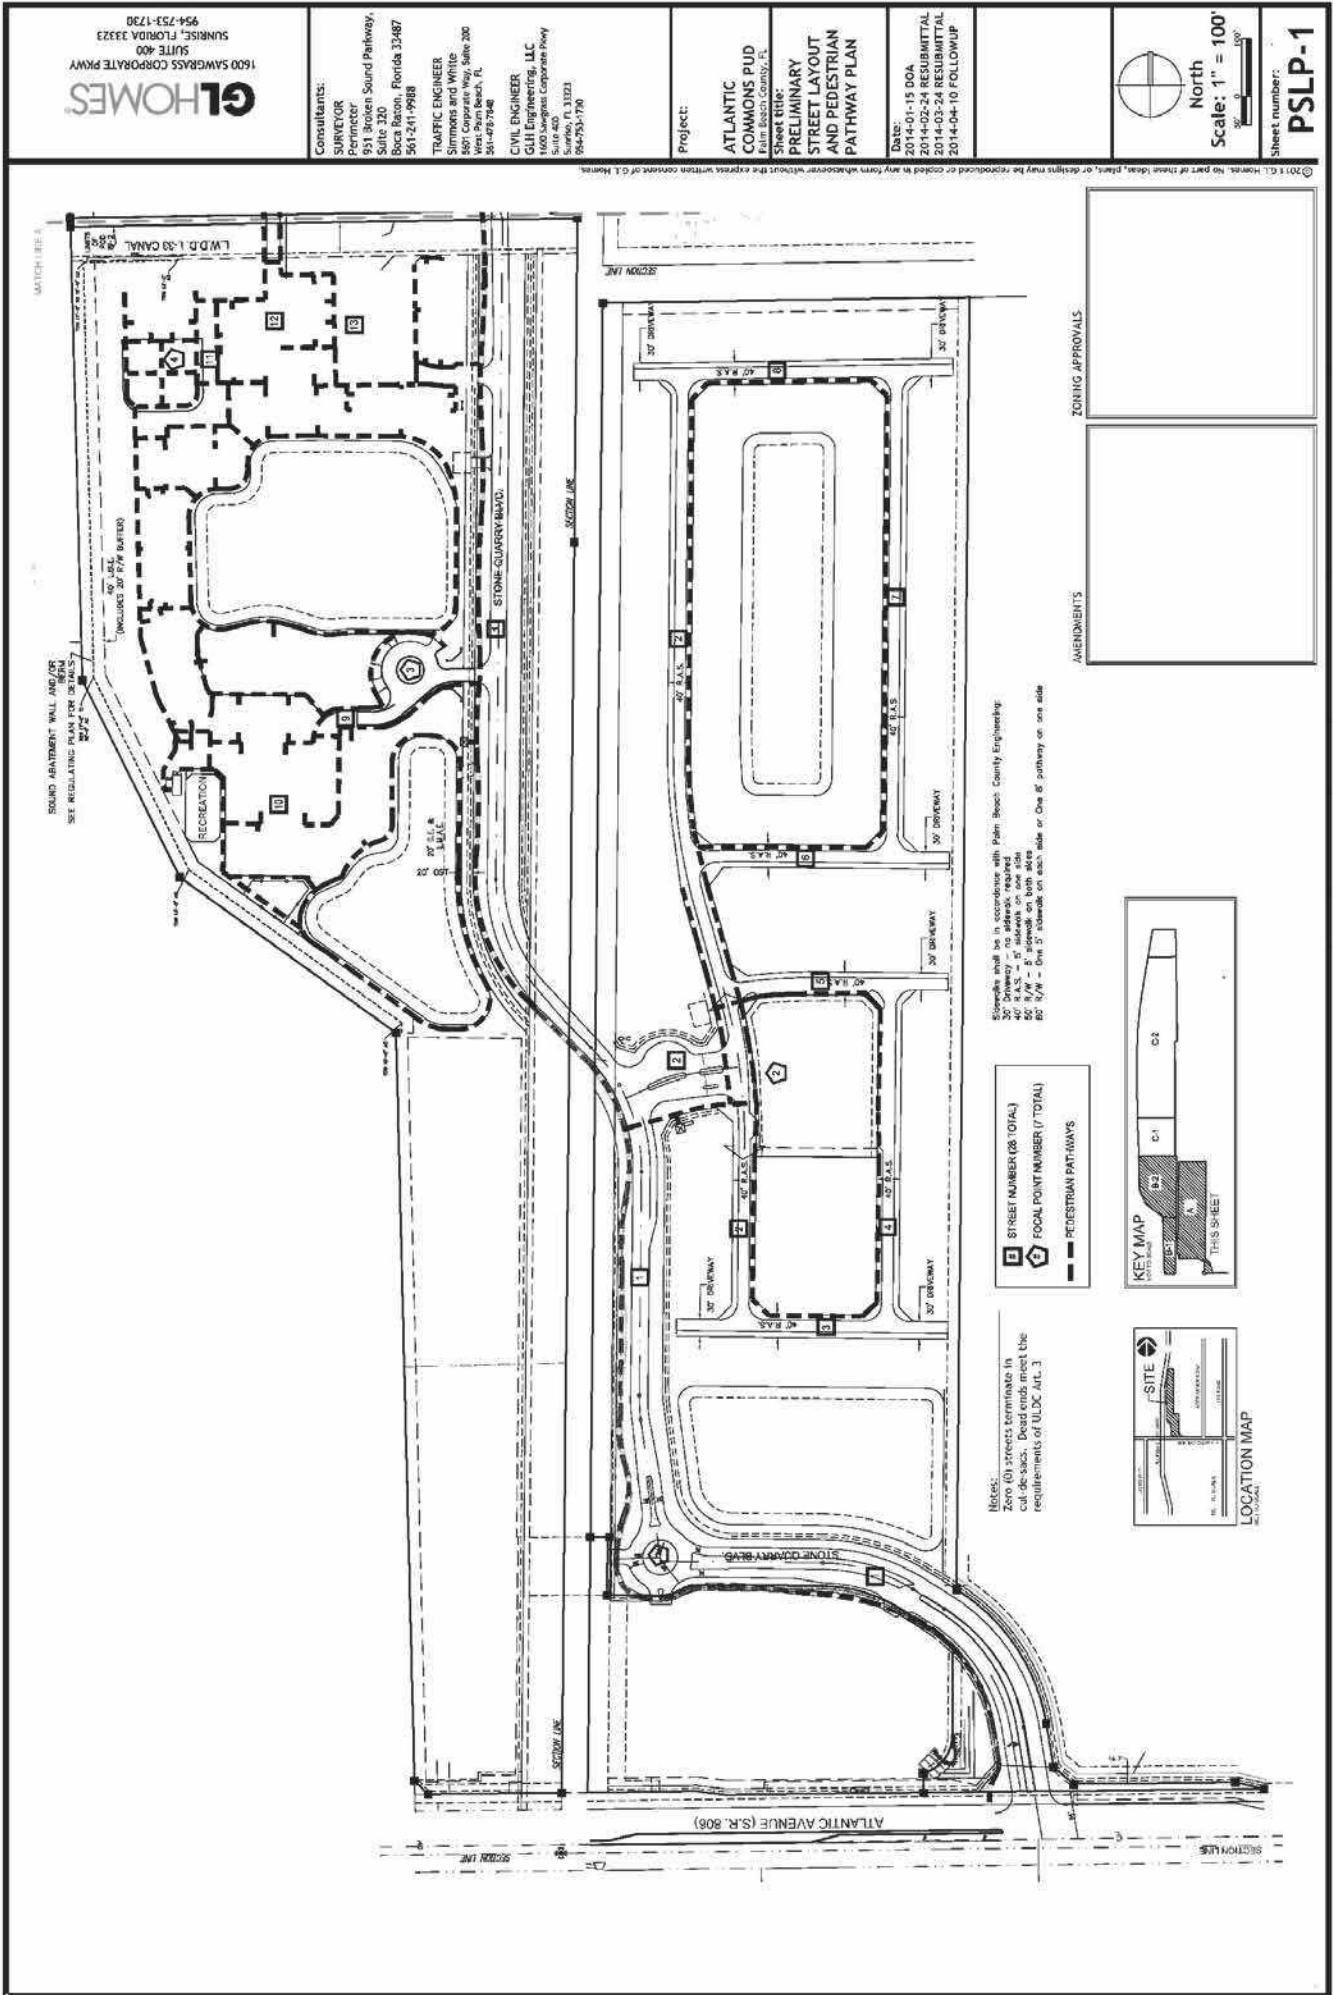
Preliminary Street Layout Plan page 2 of 3 dated April 10, 2014
